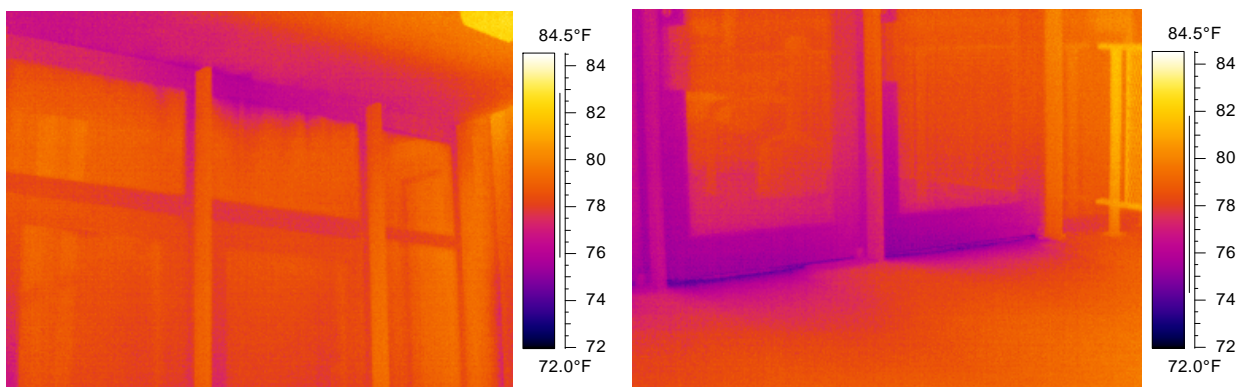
Thermograms of Upper and Lower Sections of GH 2nd Floor Lobby Single Bank Door and Window Panel
